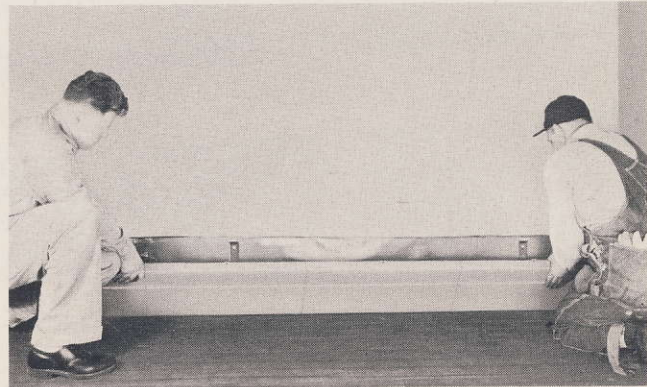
After assembled baseboard is in position, sealing strip is lapped over top.
